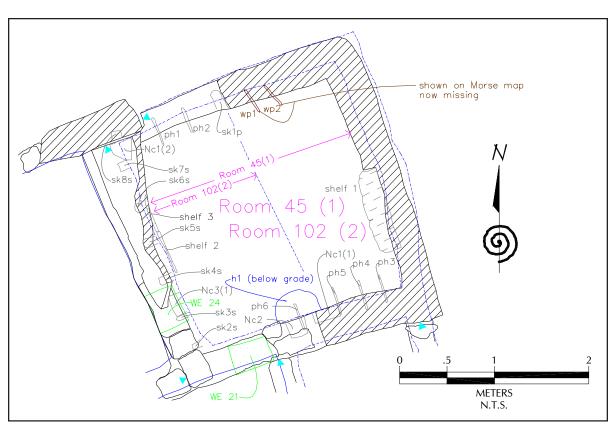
Plan View of Rooms 45(1) and 102(2).
